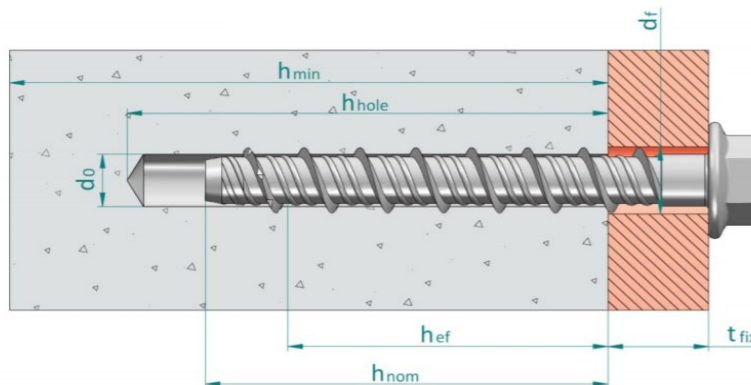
SUP-R-BOLT CONCRETE SCREW ANCHOR INSTALLATION
